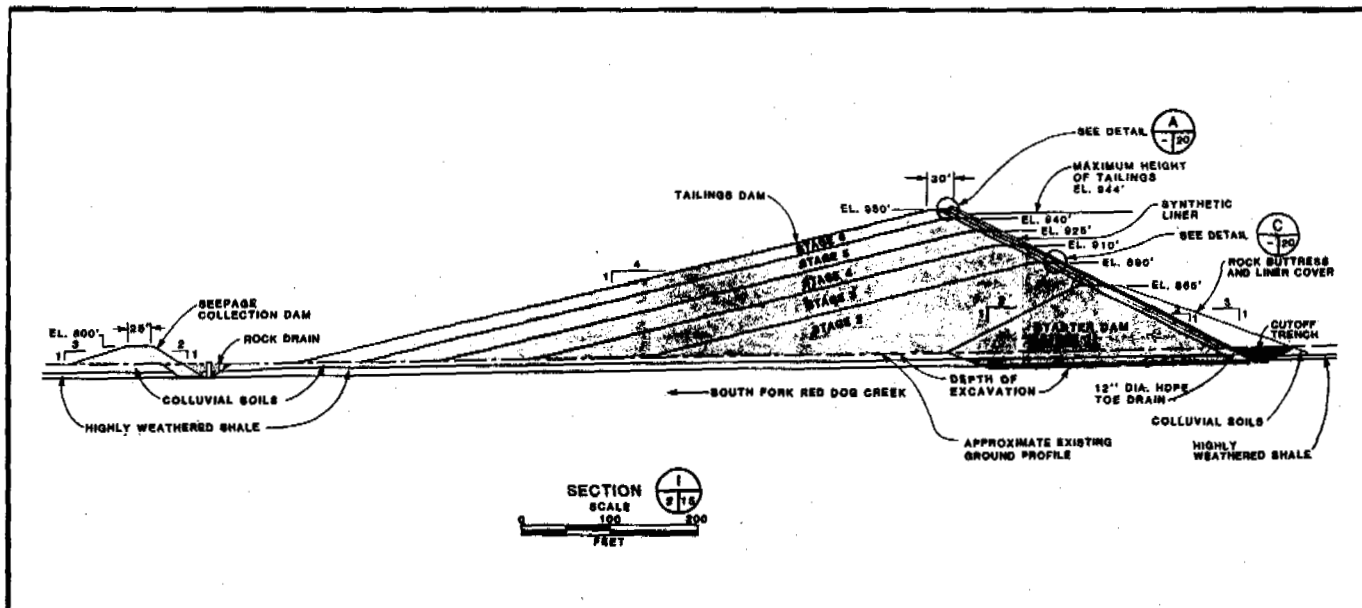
TAILINGS DAM SECTION STAGED TO MAXIMUM HEIGHT
